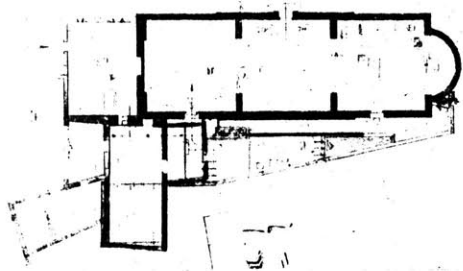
Plan of smaller building torn down by Scarpa is heavily penciled over his plan of the new addition.
